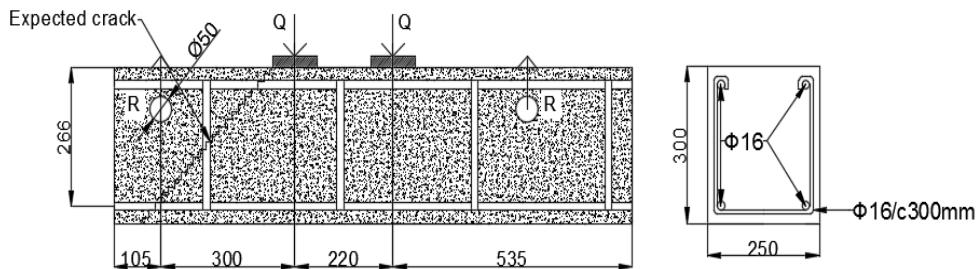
Left: Planned test set-up with expected crack. Right: Cross-section of the edge beams. Measurements in mm.
